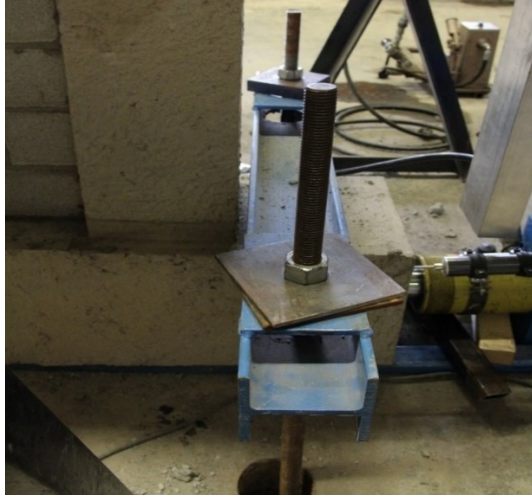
Hydraulic Actuator Connection to Test Specimen
